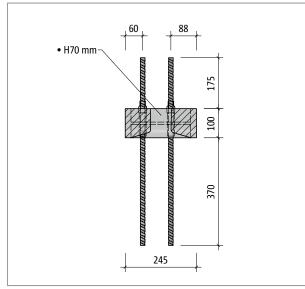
Schöck Sconnex[®] type P: Product section Part C
